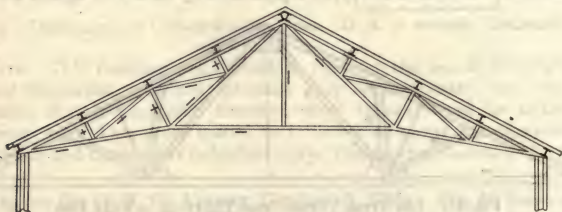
French Truss. Spans from Forty to Eighty Feet]
